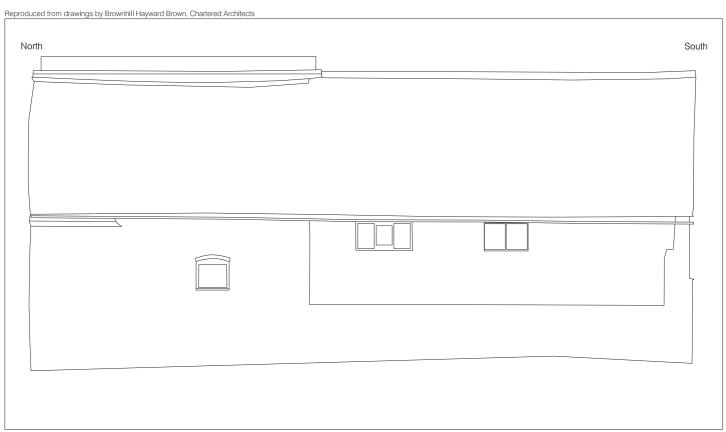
West elevation of Maltings (Building 7) Musgrove Maltings, Baldock Not to scale at A4
